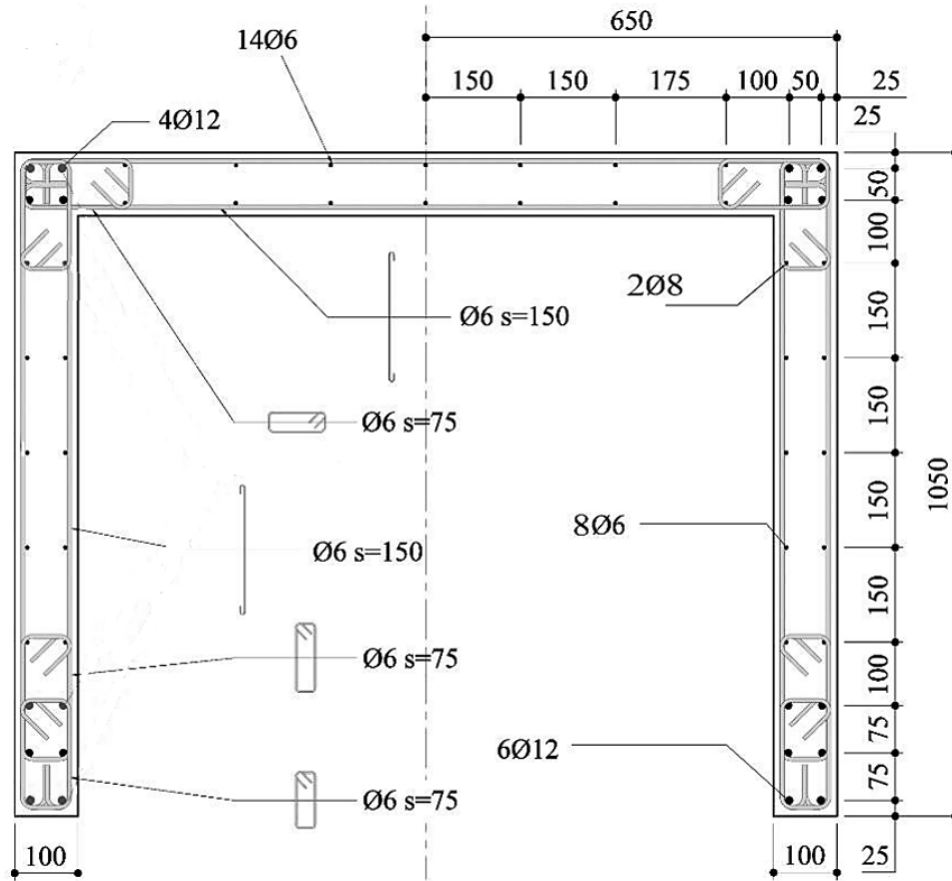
UW1: Cross section and reinforcement detailing from [26] [Unit: mm].
